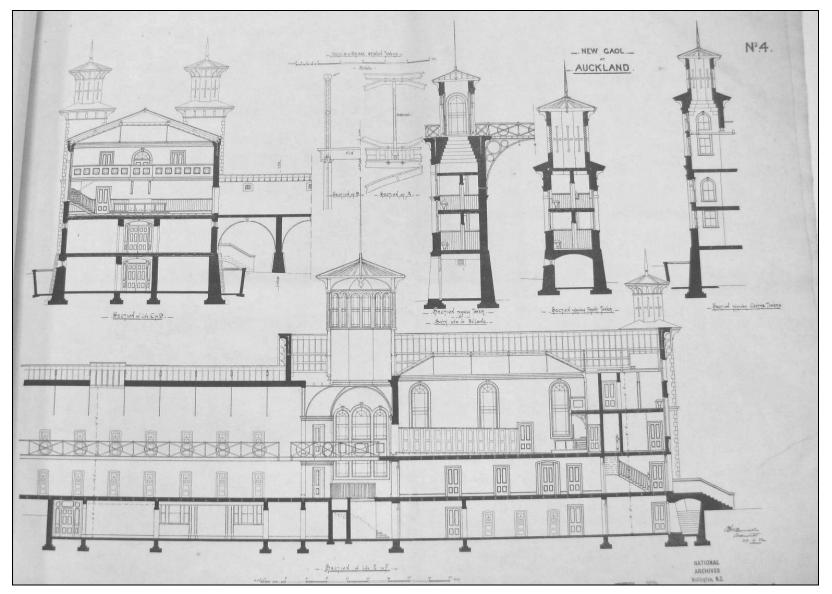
Section drawings of Prison showing interiors from the Burrow's Plan (Archives NZ)
